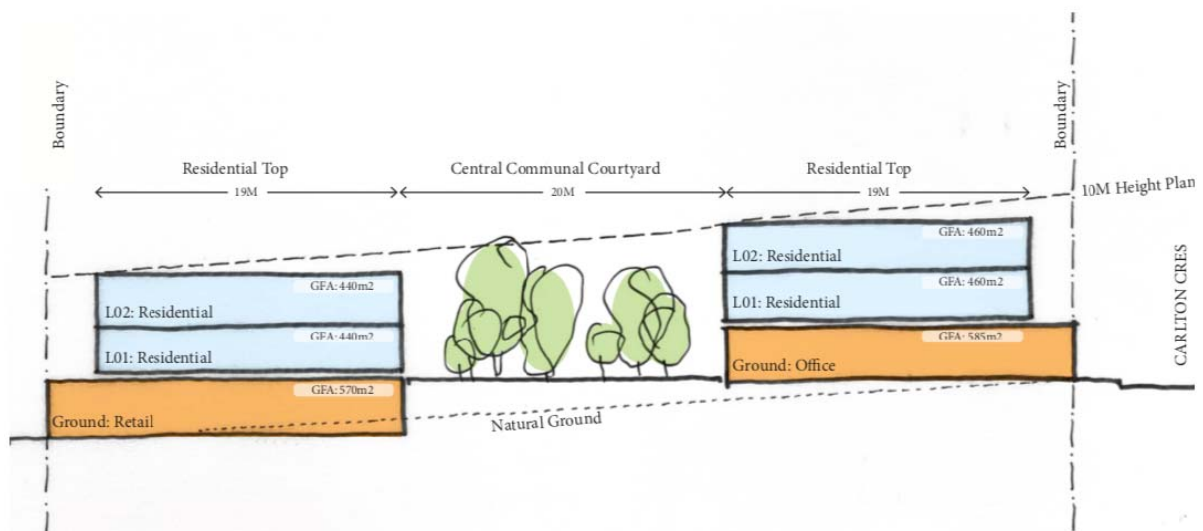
72 Carlton Crescent potential re-development building form – Section
